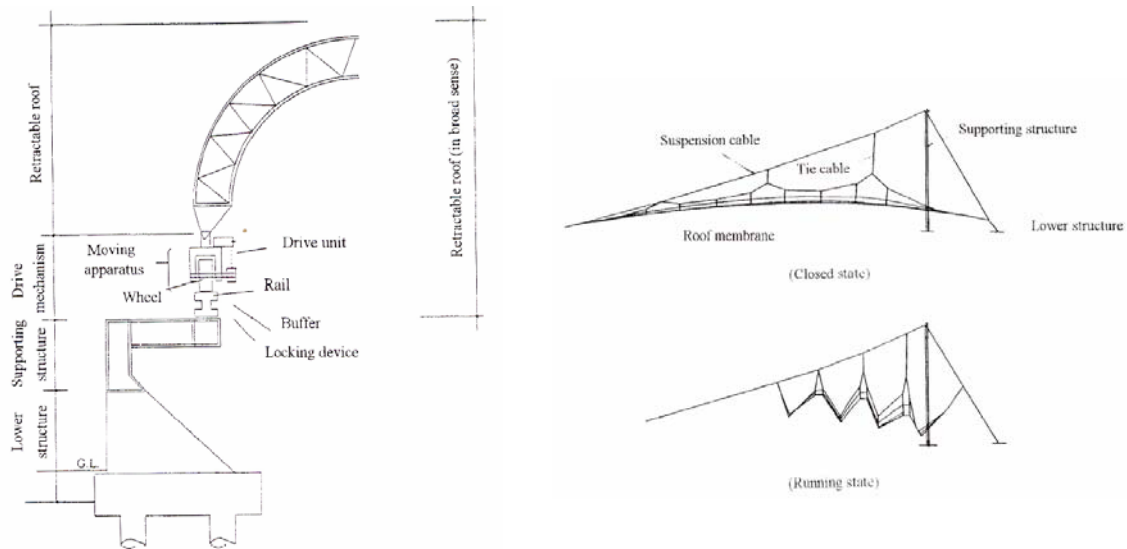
Supporting and lower structure of retractable roofs [35]
